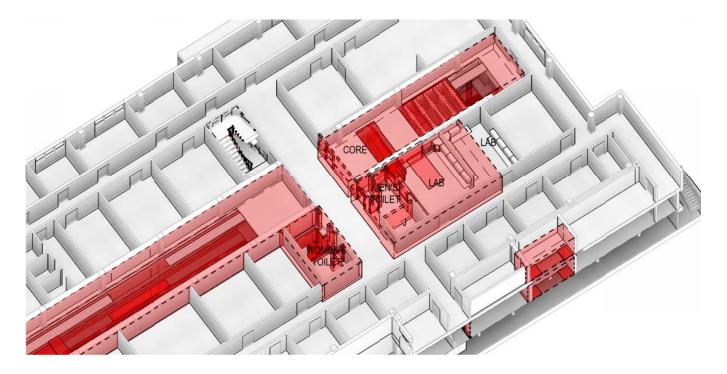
Phasing Diagram Demo Floor Plan, Level 3
